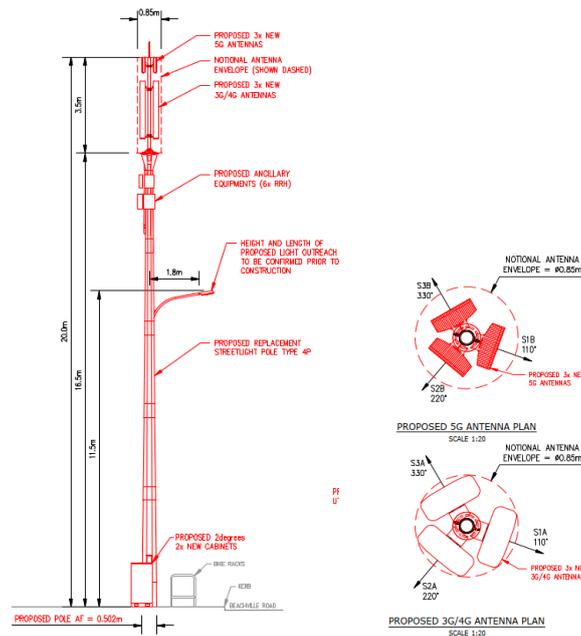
Proposed new telecommunications facility and attached antenna plan.
